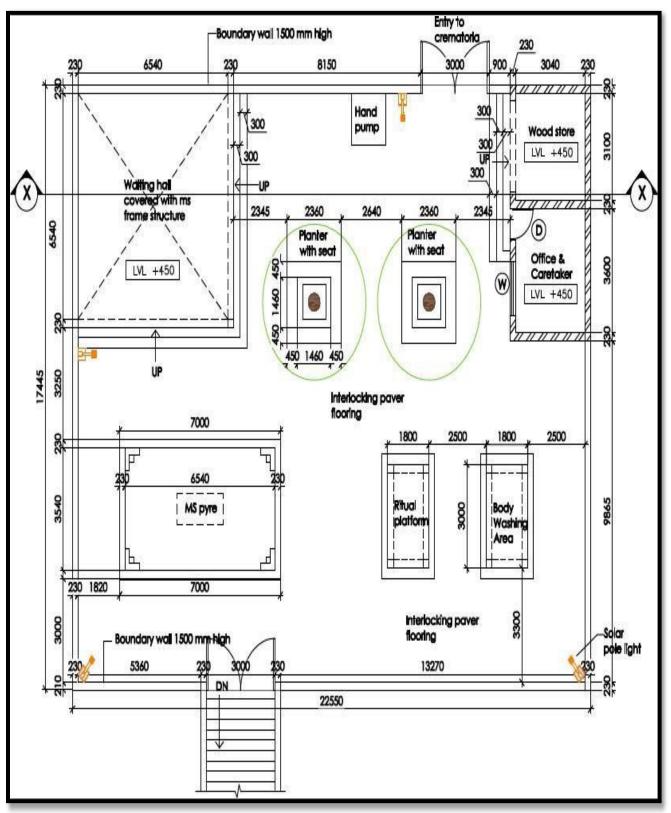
PLAN FOR CREMETORIAL COMPLEX
